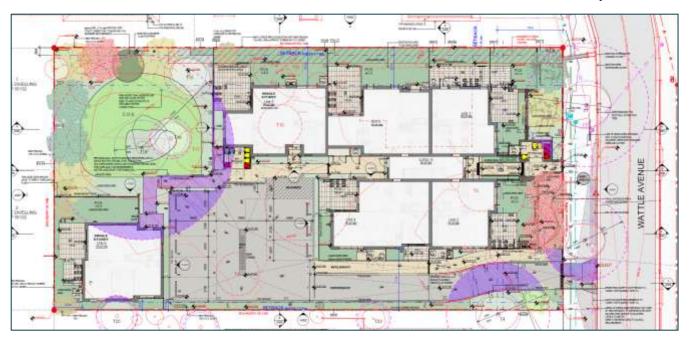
Extract from Architectural Plans - Site Plan (Source: Architectural Plans, SARM Architects, dated 30/09/2024)
